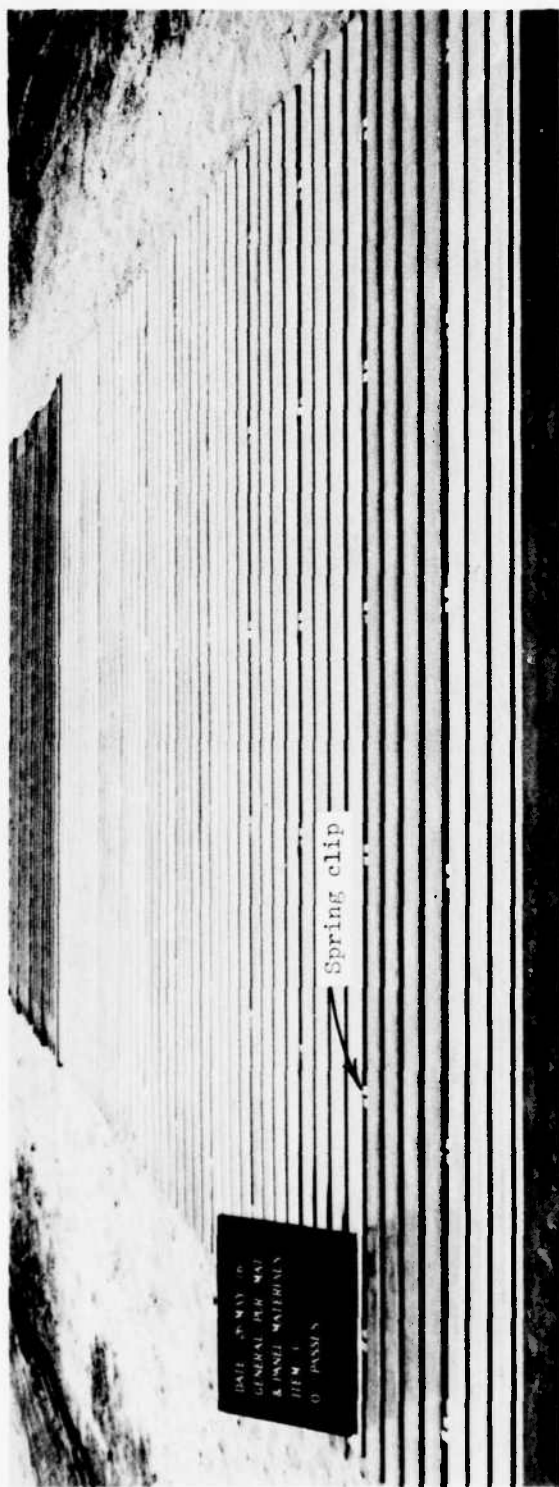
Item 3, test section 1; Fletcher formed aluminum prior to traffic
